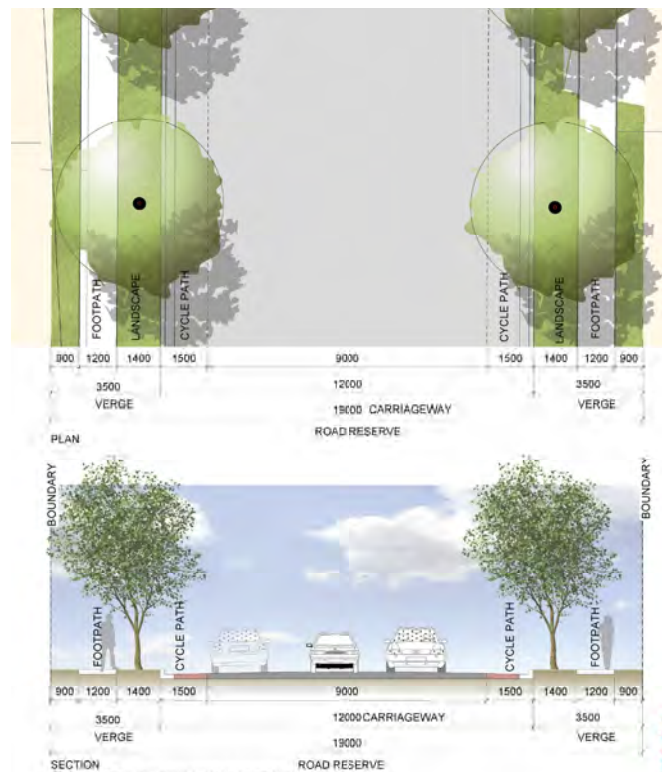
Typical Detail: Local Road (Major With Cycleway Marked on Road)
